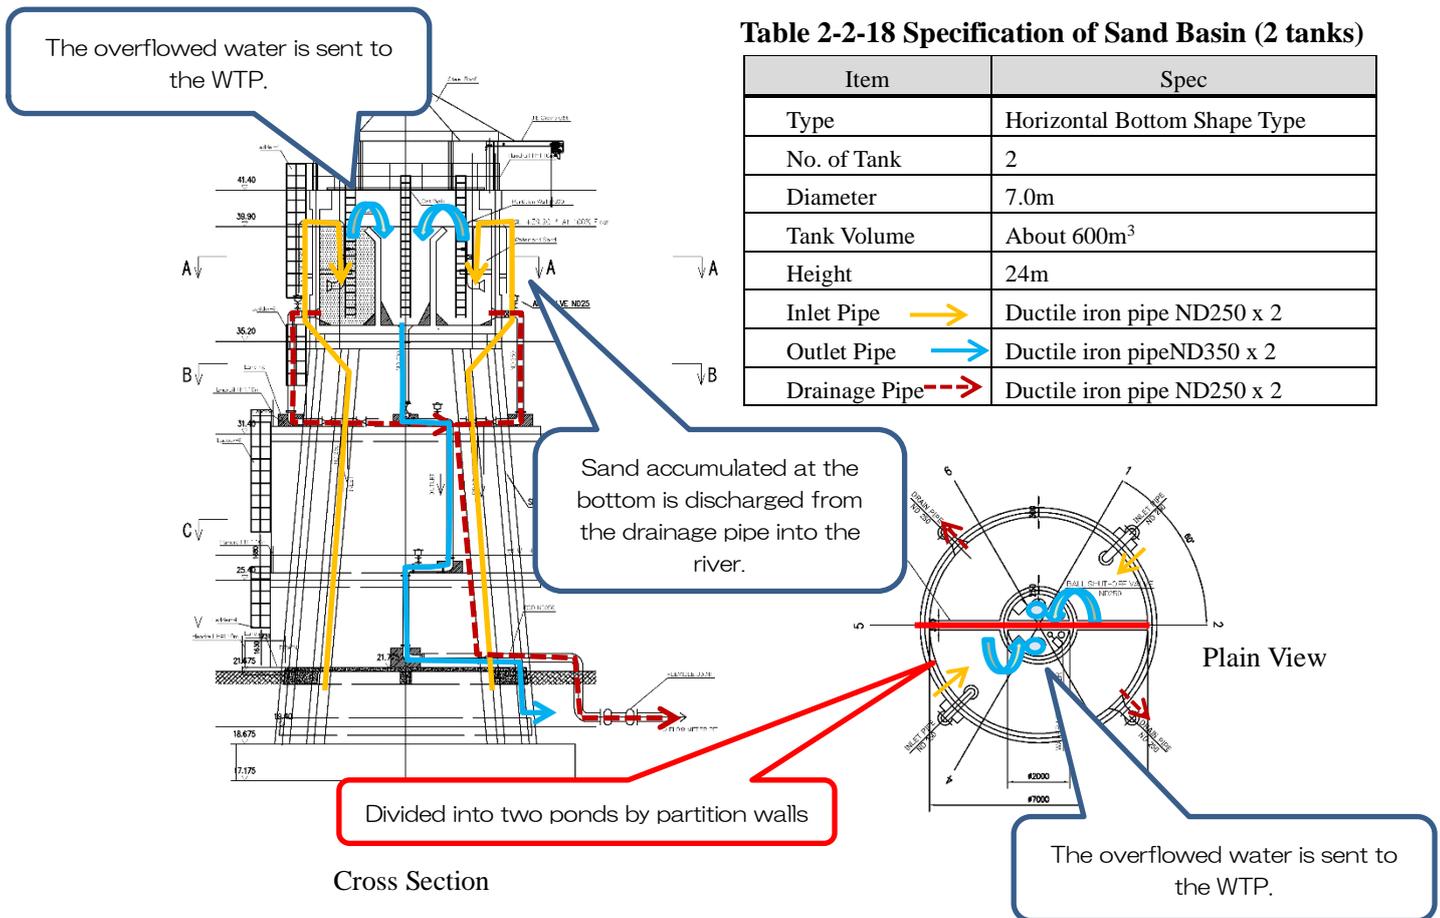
Concept of Horizontal Bottom Shape Type Sand Basin (2Tanks)
